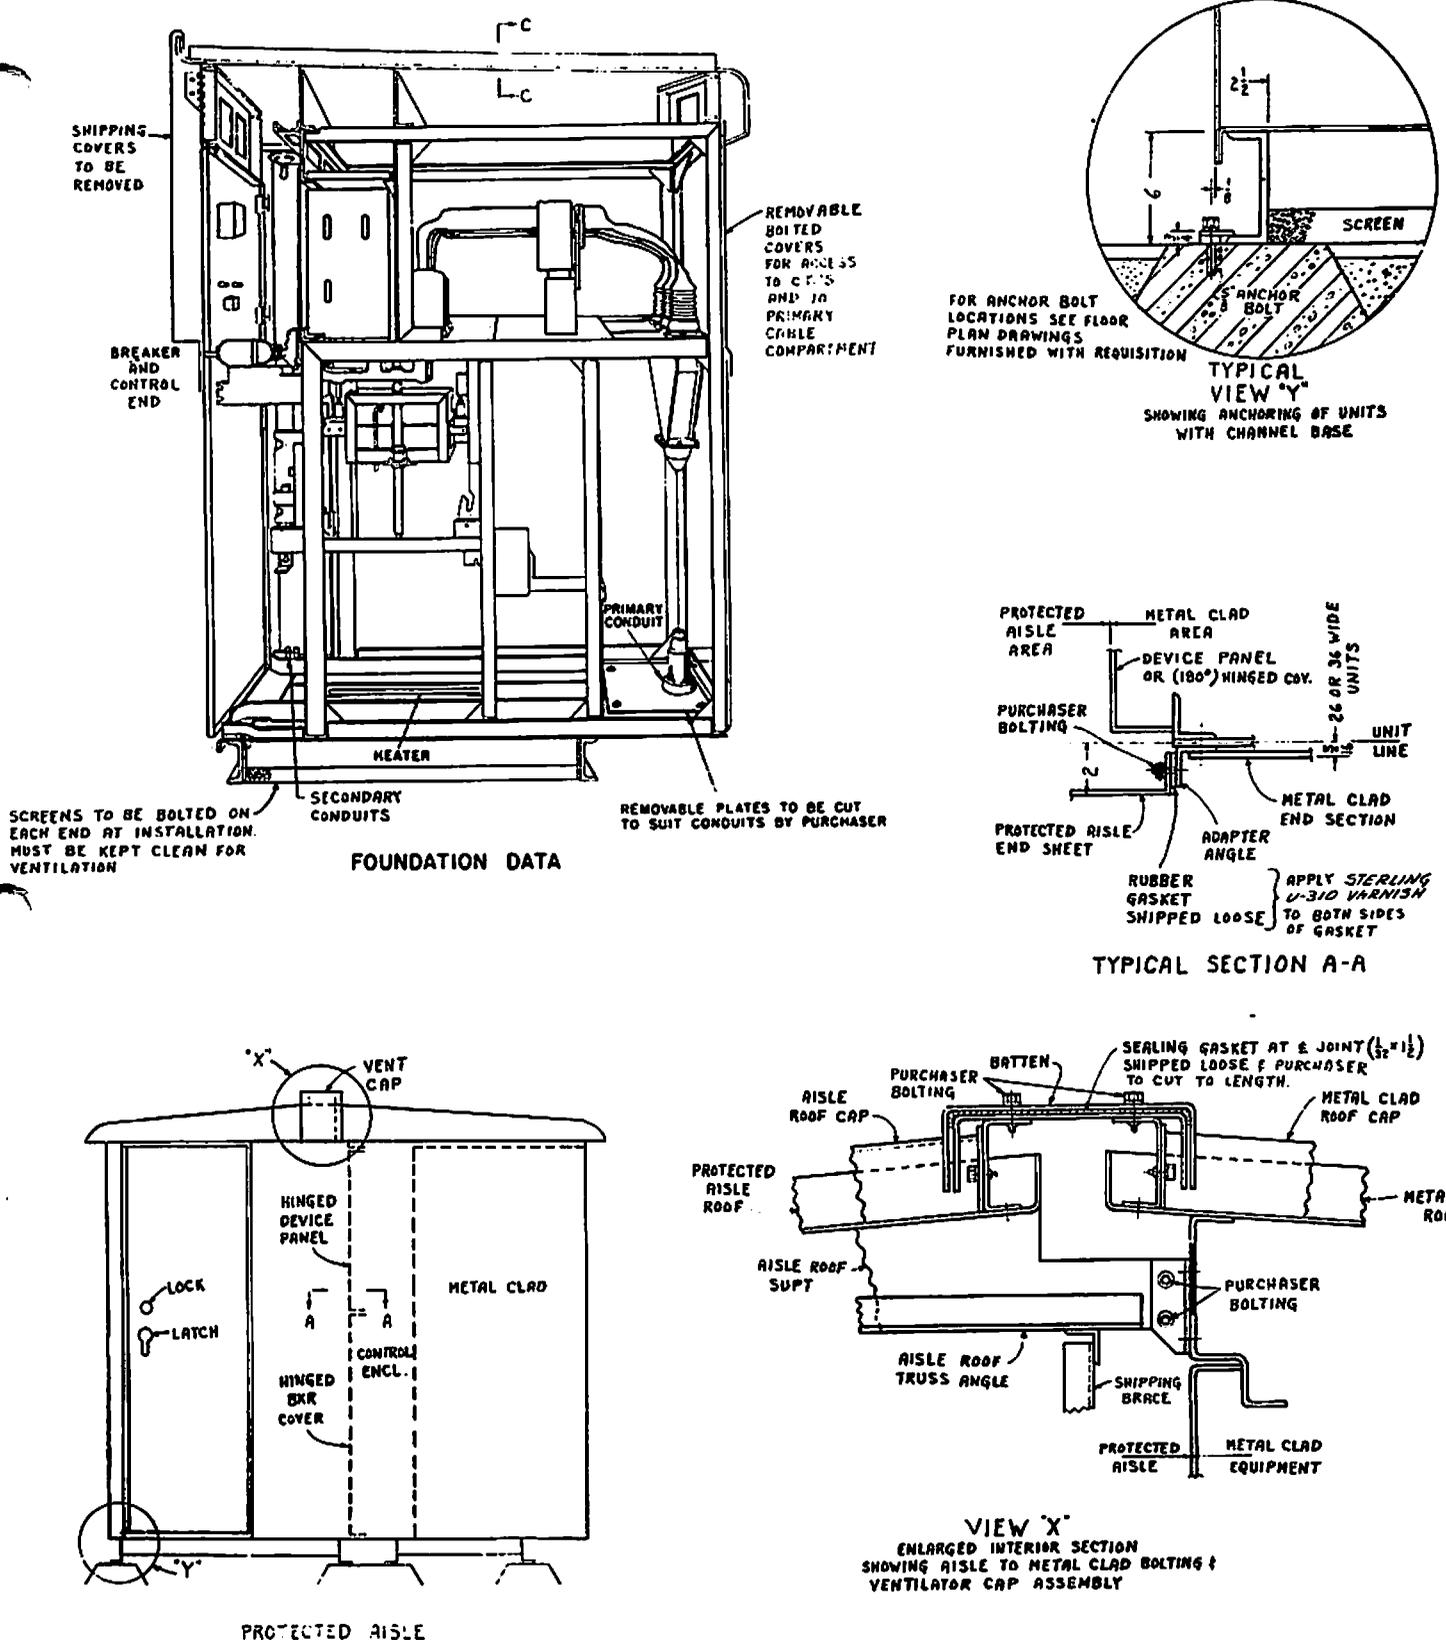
Installation Details for Outdoor Metal-clad Switchgear with Protected Aisle
